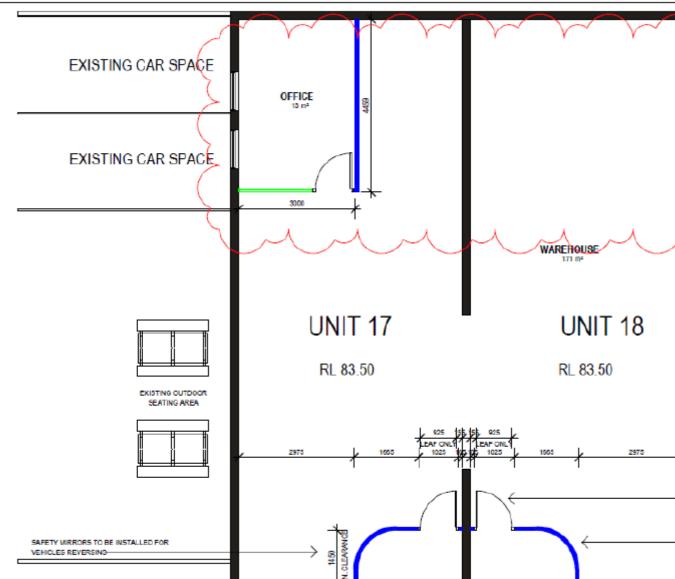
Proposed Ground Floor Plan, Drawing No. A090, Issue 6 Source: Strutt Studios
